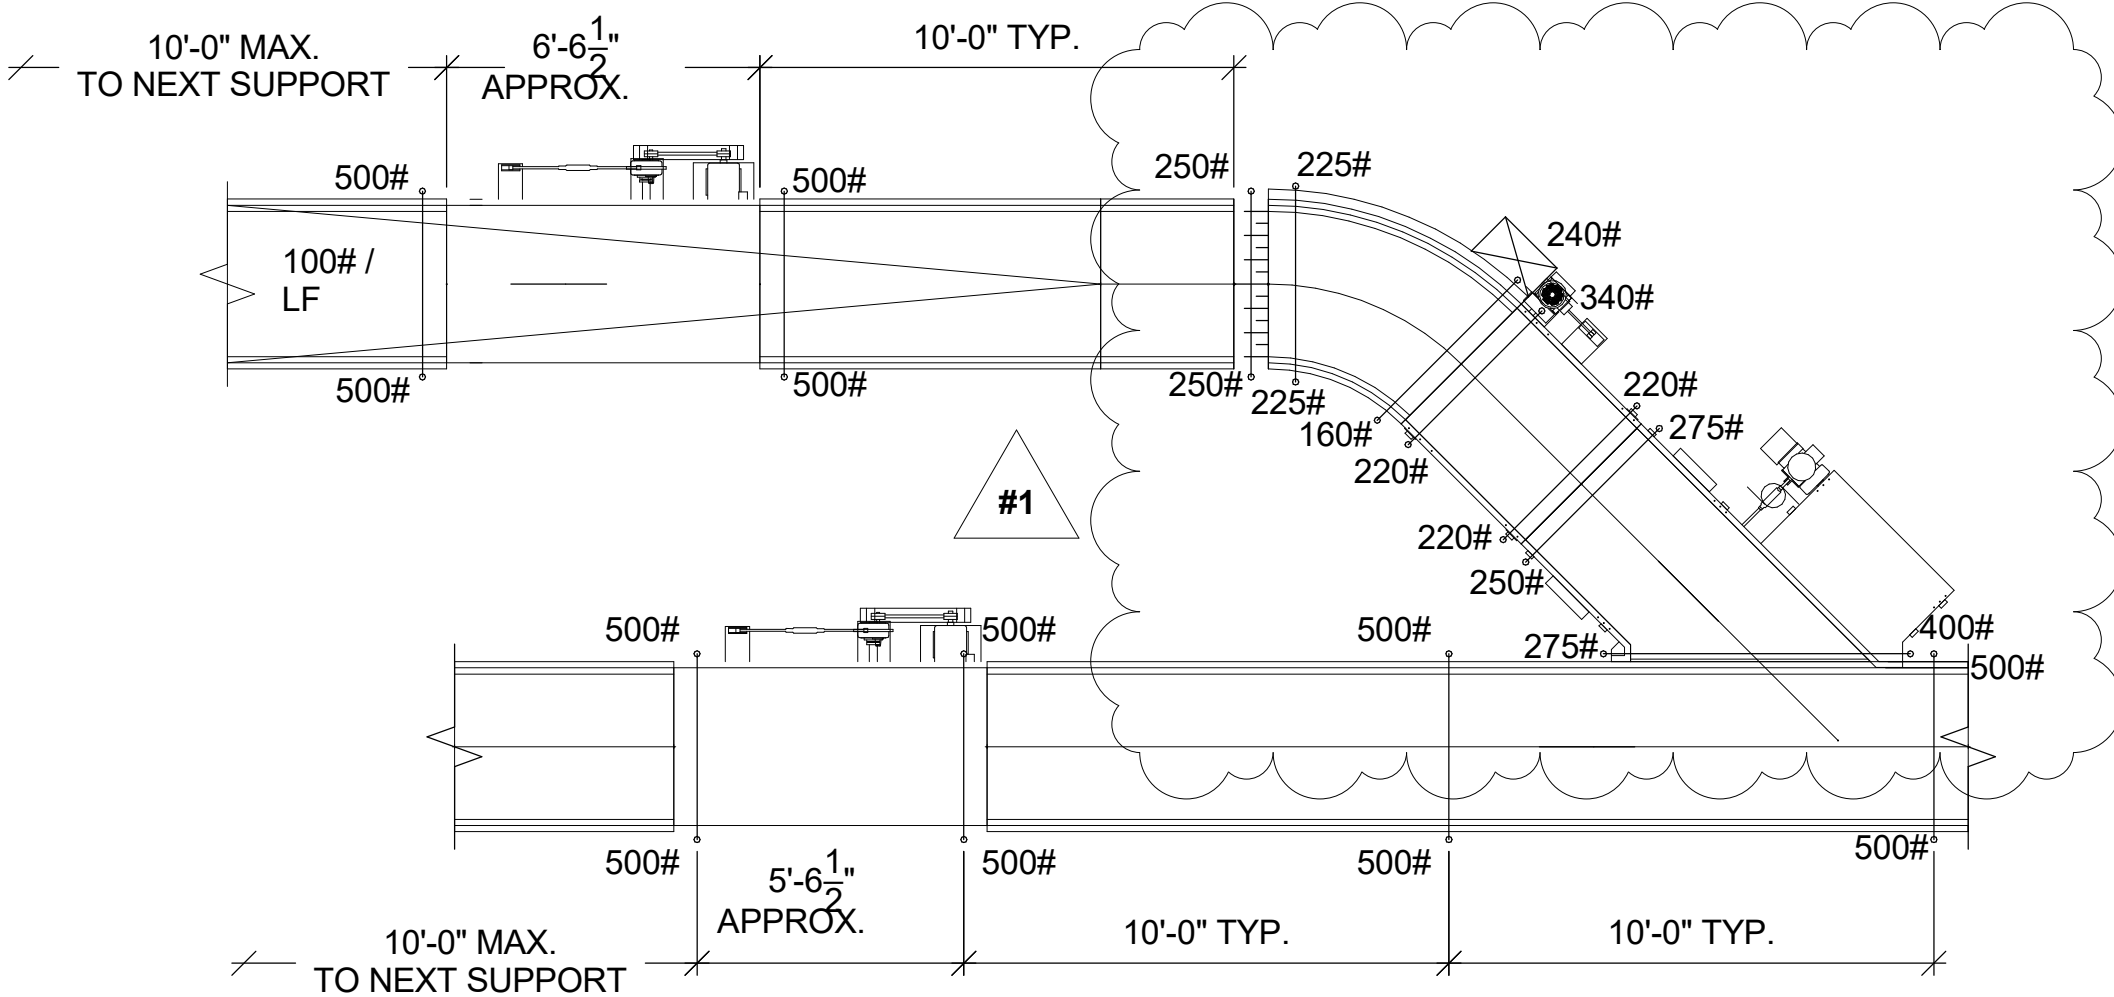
DETAIL PLAN - SINGLE LEVEL CONVEYOR SUPPORT
